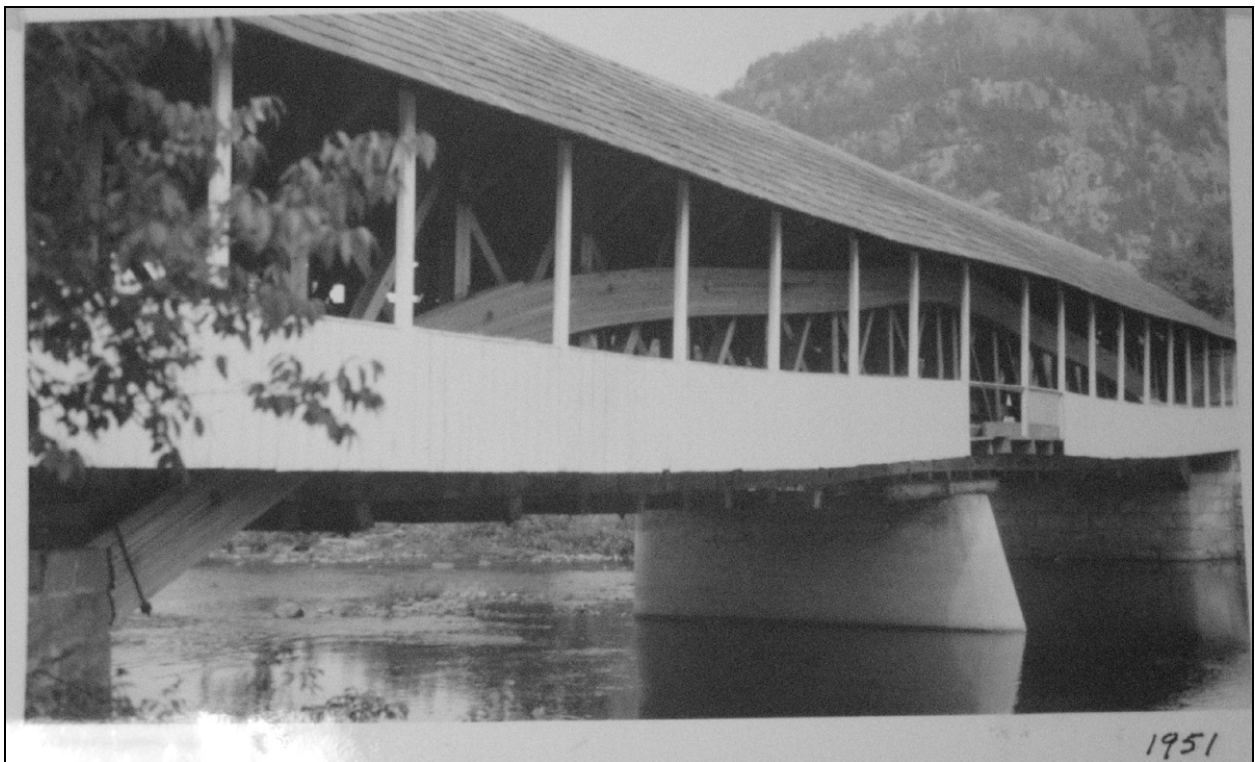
NHHD Bridge Inventory Card photo dated 1951 showing new pier built in 1948 and wood arch, lifted and slightly less deformed than seen in Figure 13.
